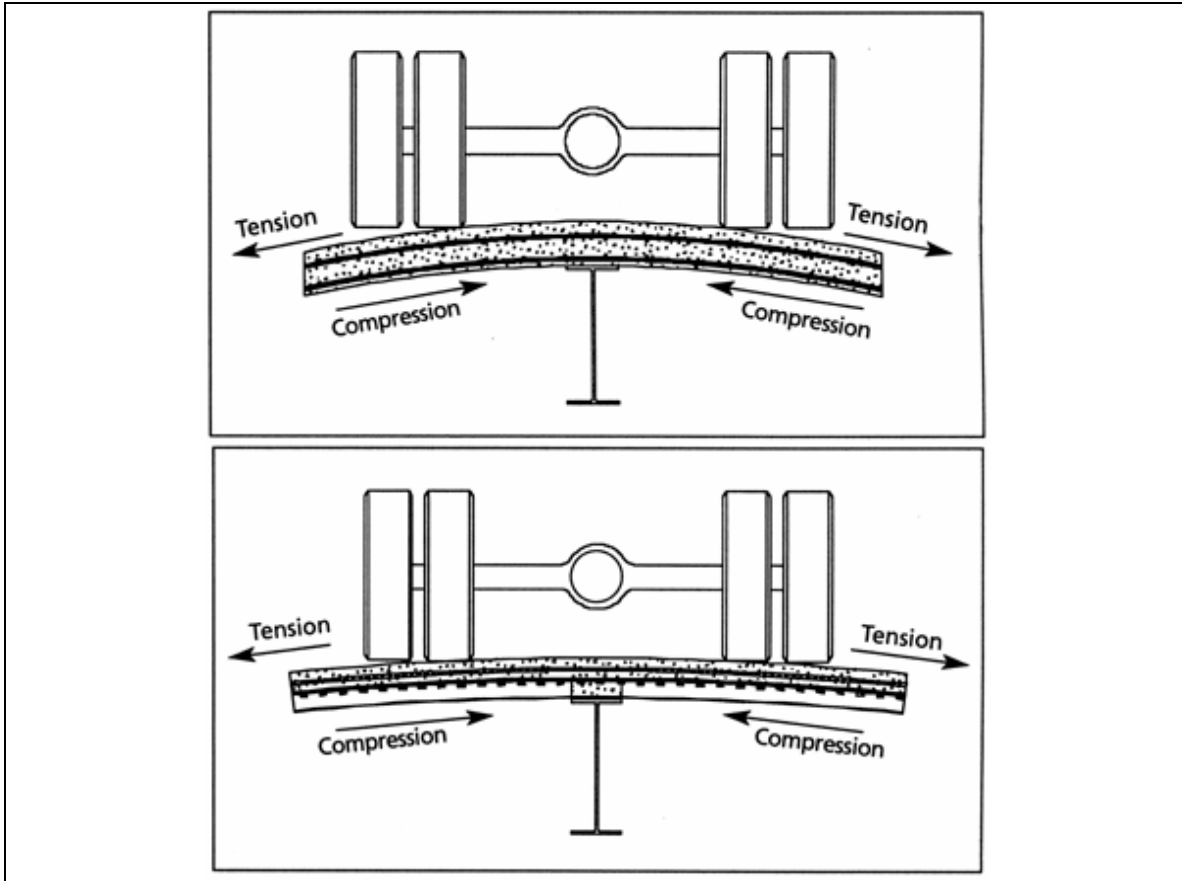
Standard concrete slab and Exodermic deck in negative bending (EBDI, 1998)
